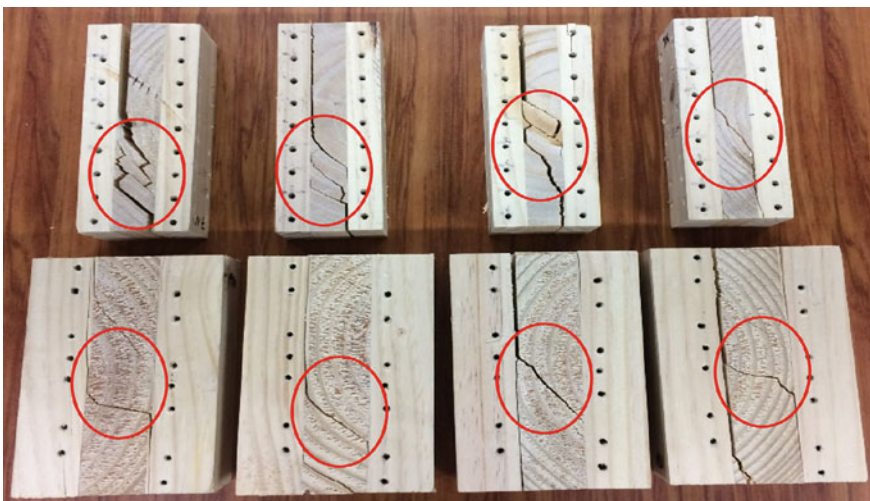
Typical rolling shear failure of CLT specimens (Source Li 2017)
